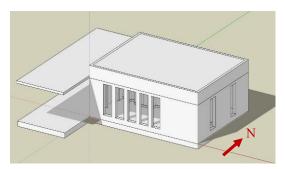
1000-sqft building with EC windows on South façade and porch on West side
